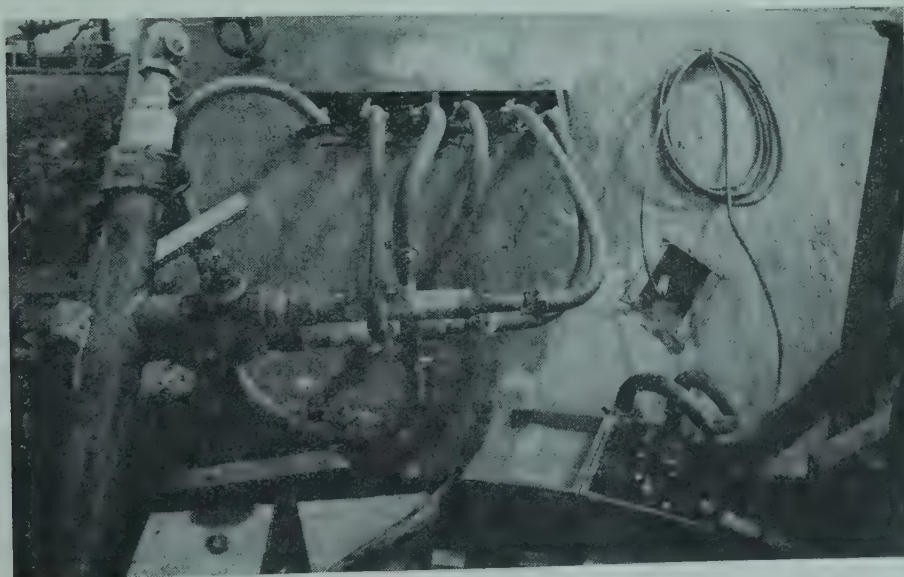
Piping and Test Equipment Give Fontana Dam Appearance of Industrial Plant.
